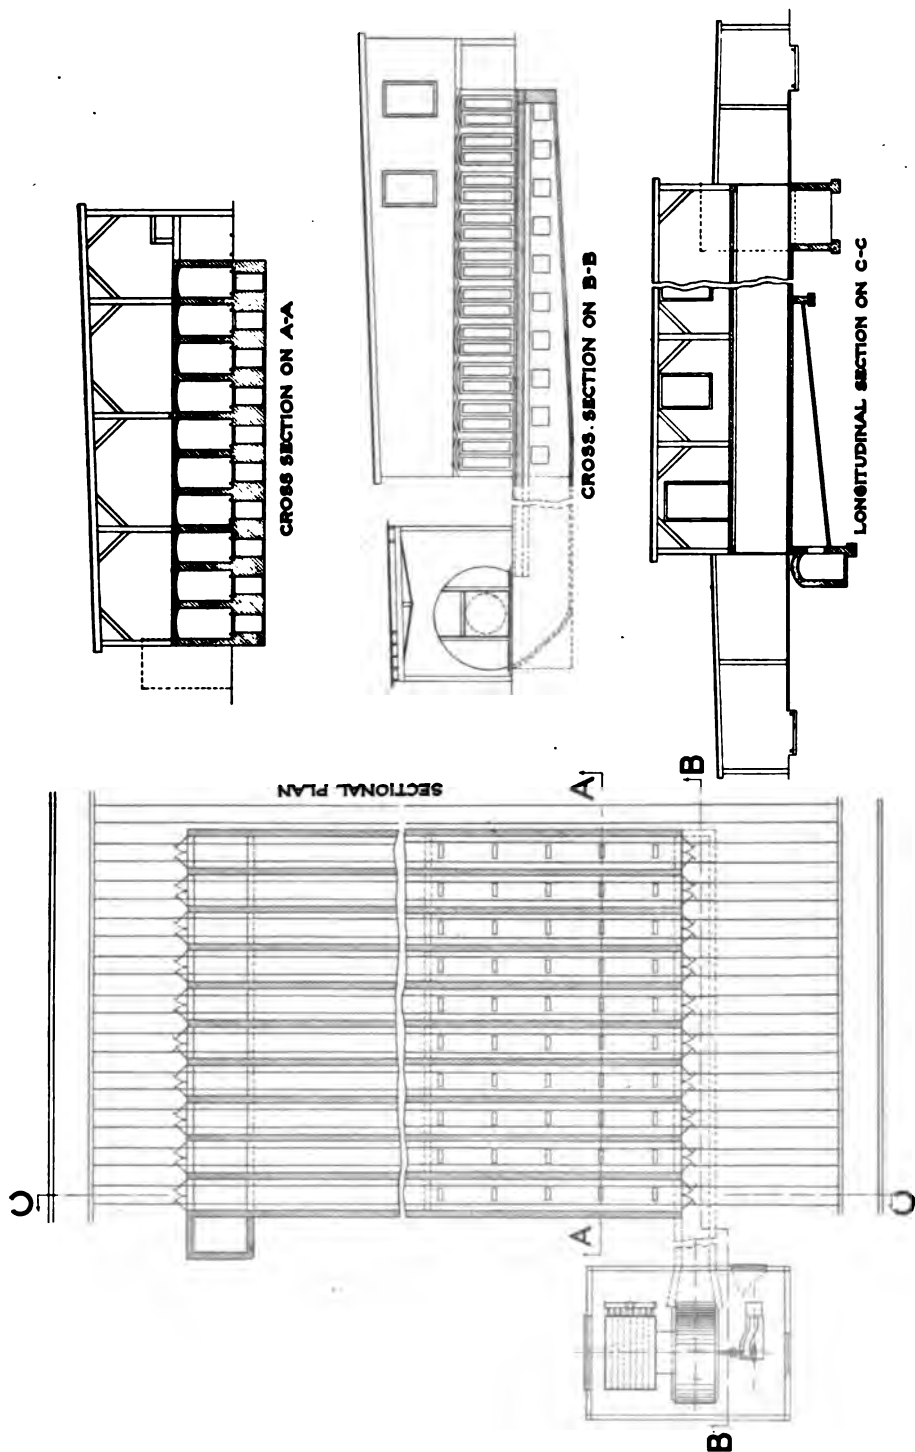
Plan of Dryer at United States Roofing Tile Company, Parkersburg, W. Va.
